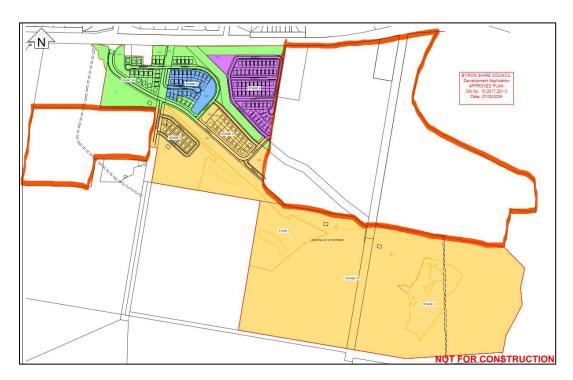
Approved Staging Plan for Harvest Estate showing surrounding Site R & D in red highlight
